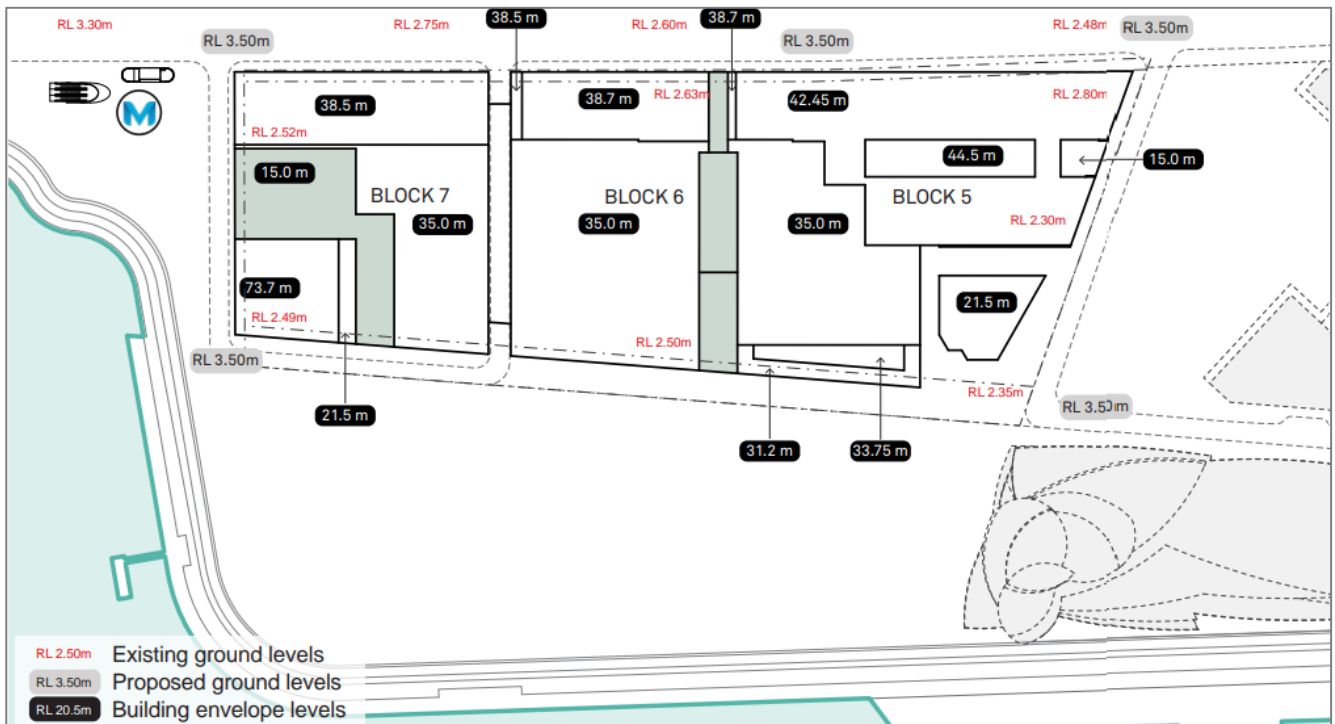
EXHIBITED CONCEPT BUILDING ENVELOPE PLAN (HASSELL)
